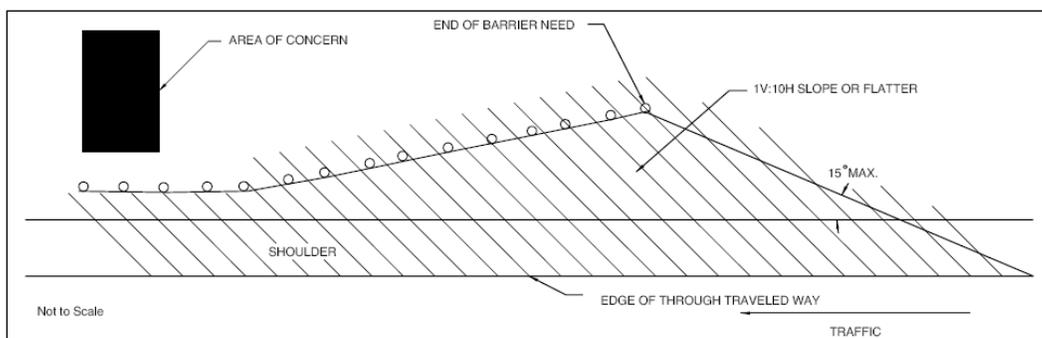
Recommended roadside slopes for barrier placement (AASHTO 2006).
